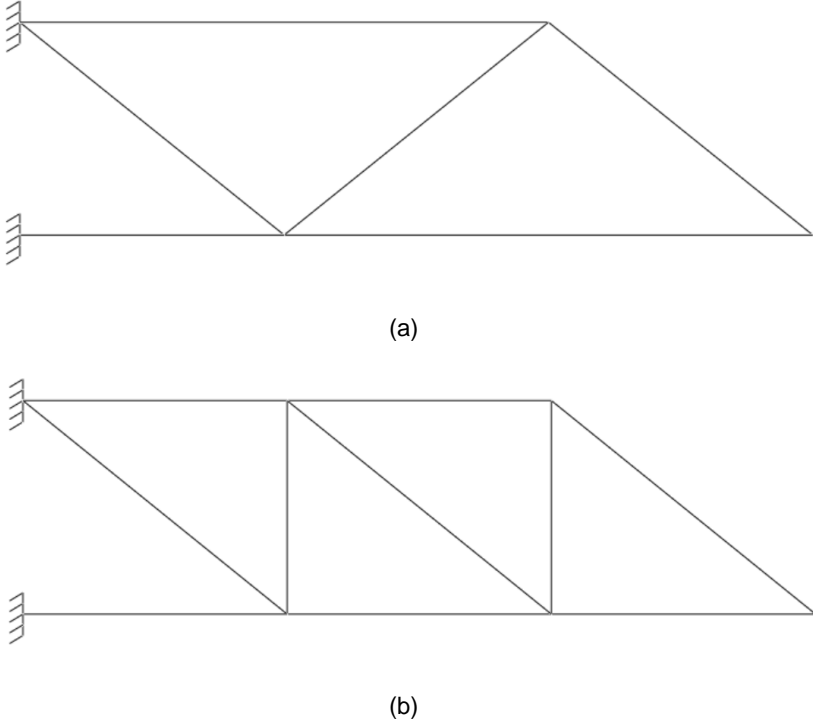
Types of trusses - (a) Warren truss; (b) Pratt truss.
